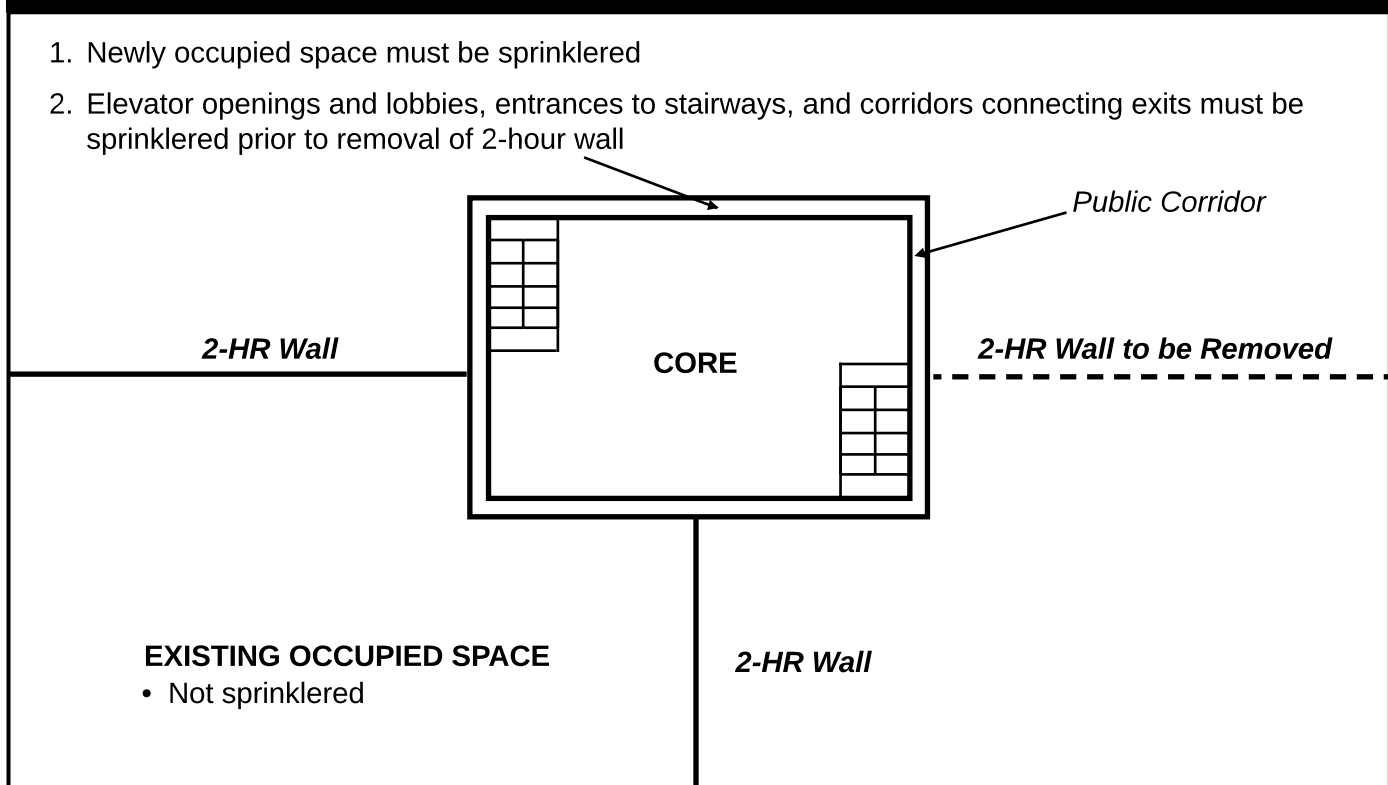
Removal of a 2-hour wall on an existing, compartmented floor
